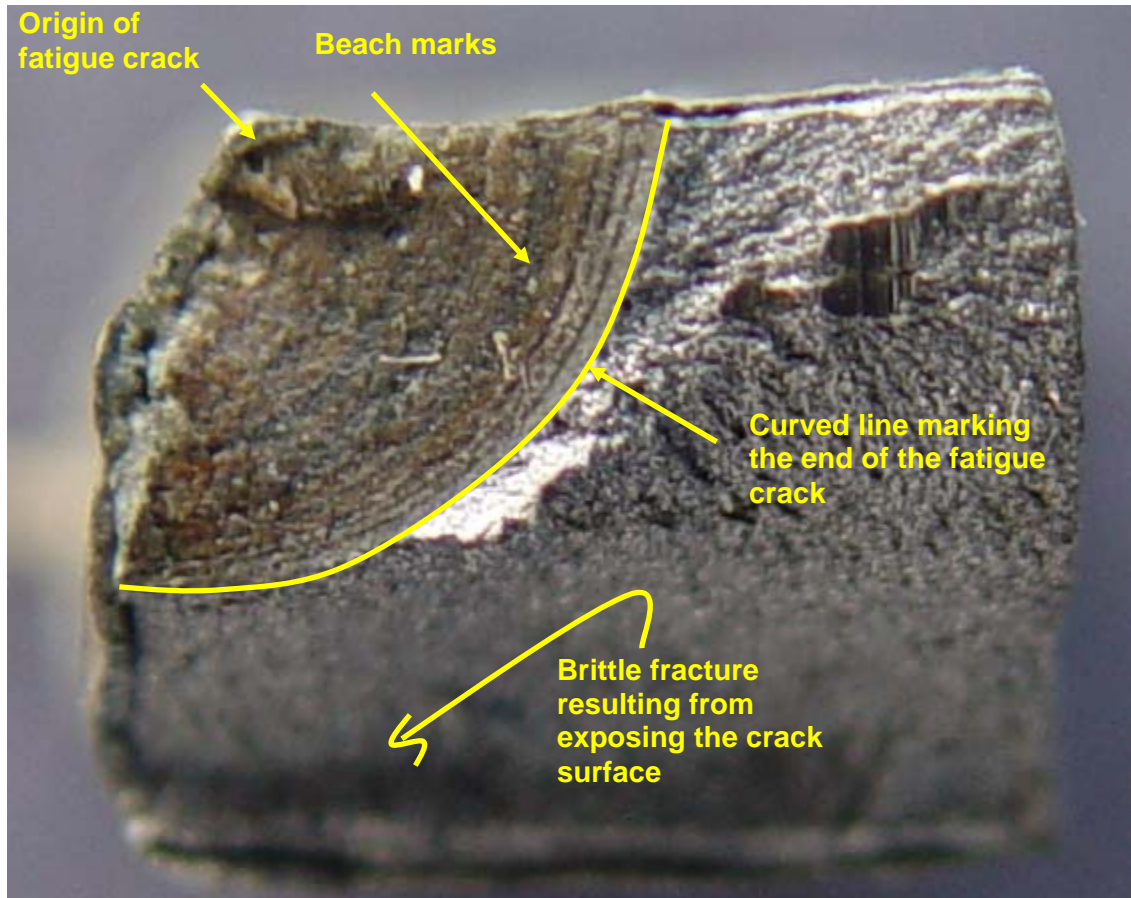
Close up of exposed crack surface of the galvanized connection flange detail of figure 2.4 showing fatigue beach marks
